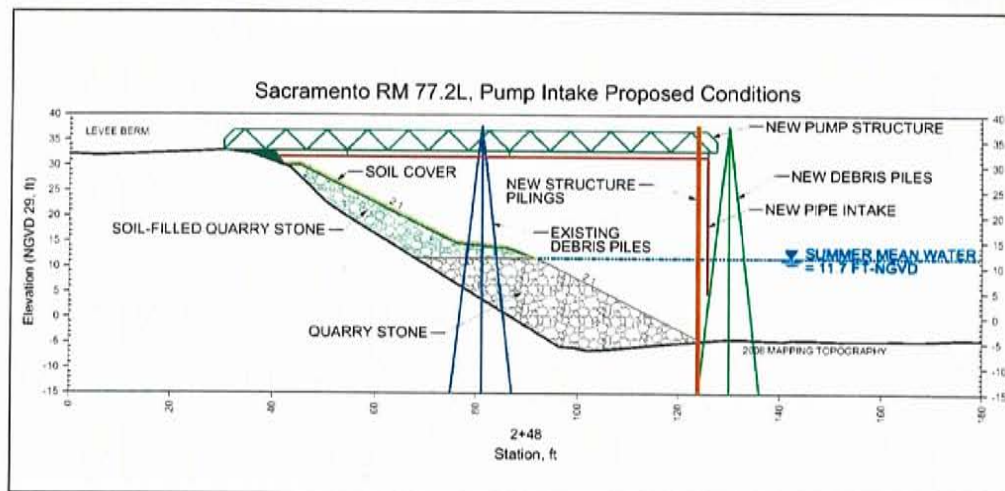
Proposed conditions cross section at SAC RM 77.2L at the pump structure location.
